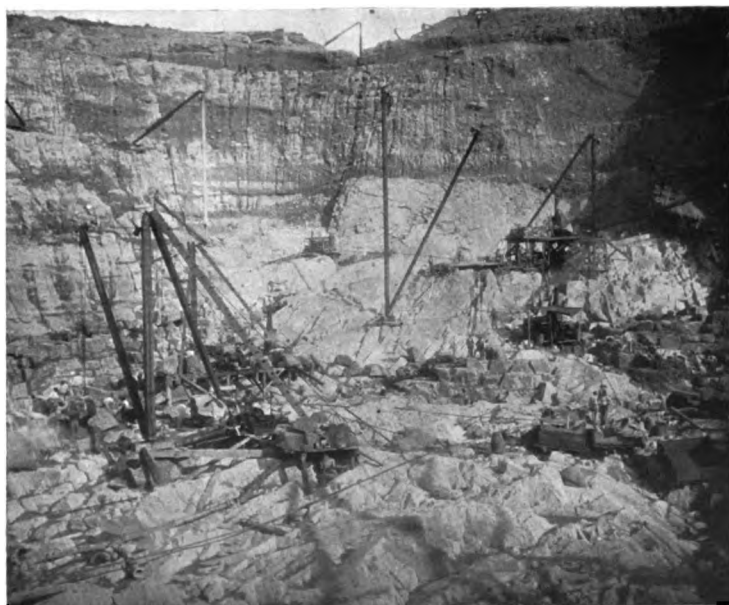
AUGUST 12TH, 1897. ROCK EXCAVATION, LOOKING SOUTH FROM STATION 6 + 00, 60 L.
